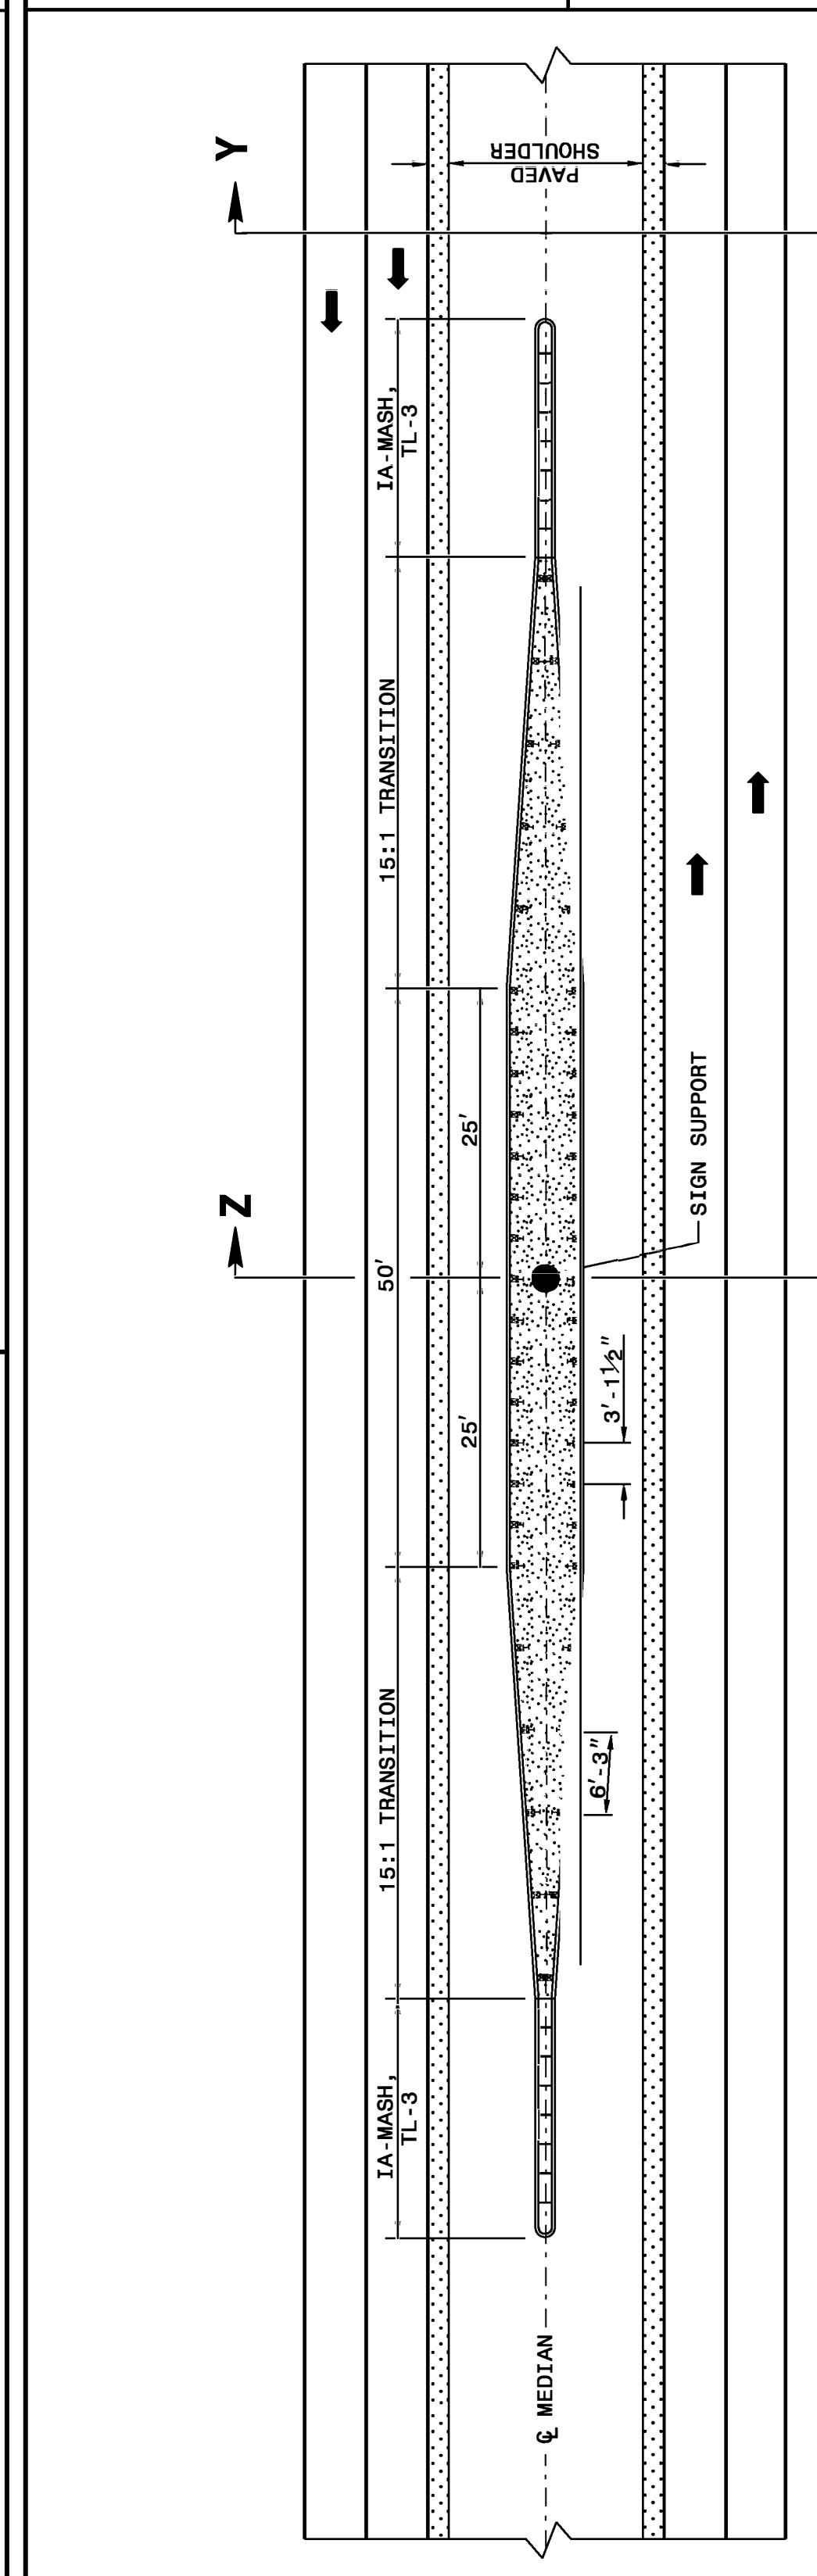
DETAIL OF MEDIAN TREATMENT AT UNDERPASS
